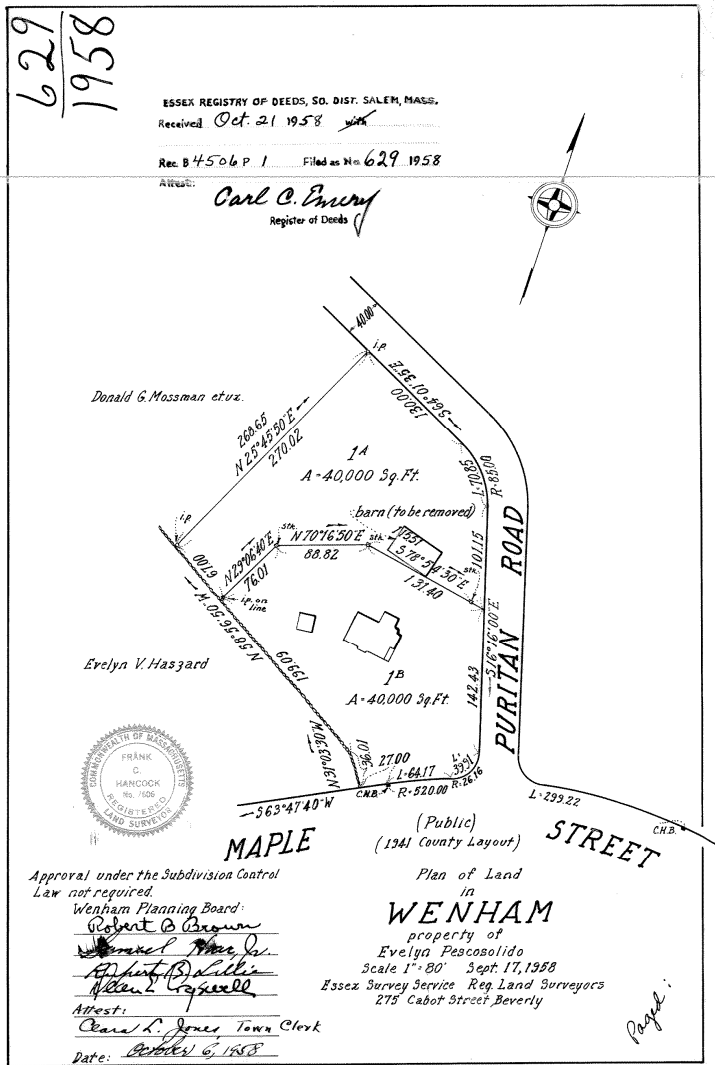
1958 site plan showing the house, North Kimball Barn (with reduced footprint compared to 1955) and West Kimball Barn.¹¹
